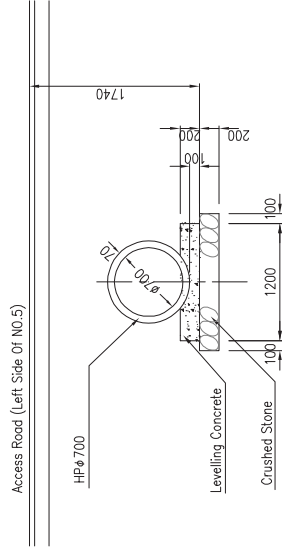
## DETAIL OF DRAINAGE (SOUNBA BRIDGE)
